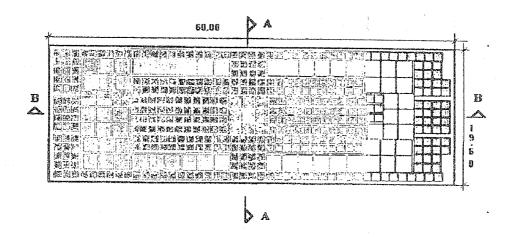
a: Plan view of containers arrangement of the proposed repository
